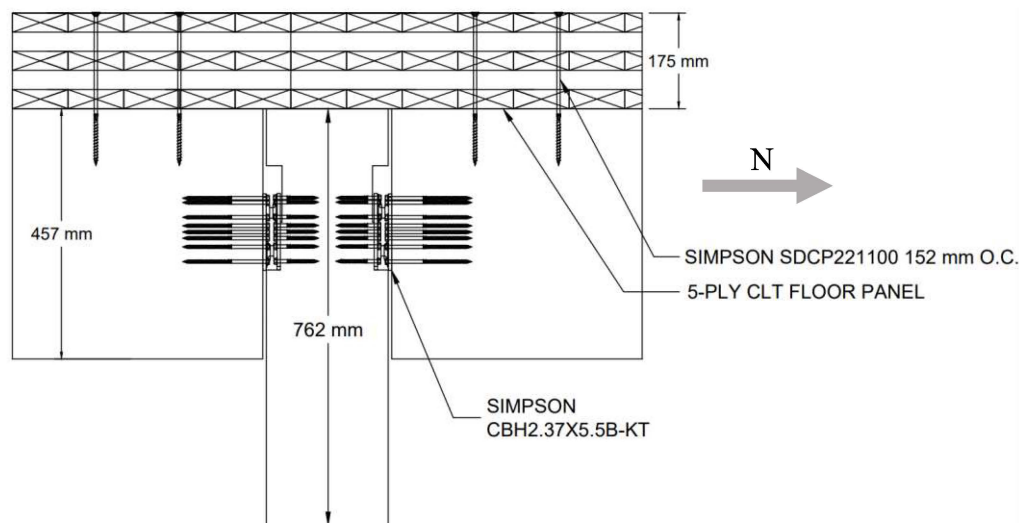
Beam-Column Connection Elevation View (north arrow shown)
